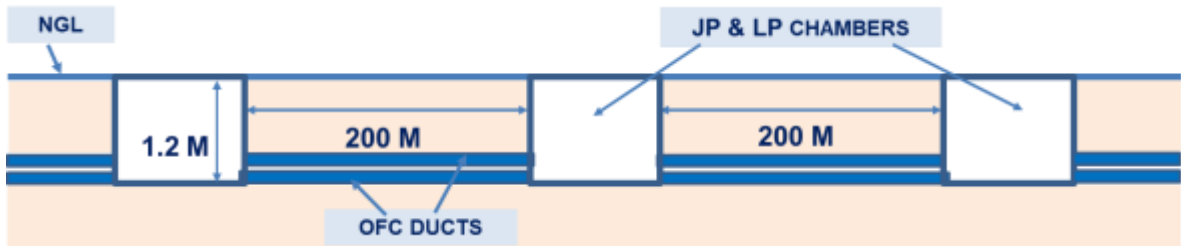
Joint Pit & Loop Pit Chamber (Manhole) Under Road- Elevation View
